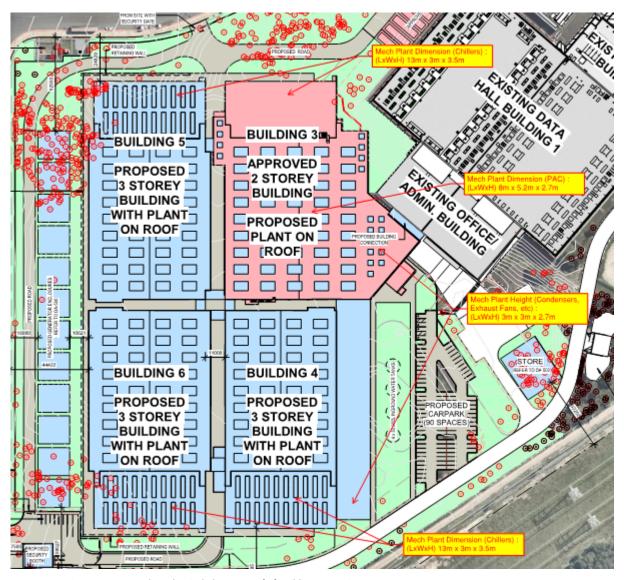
Proposed Mechanical Plant on roof of Buildings 3,4,5 & 6
